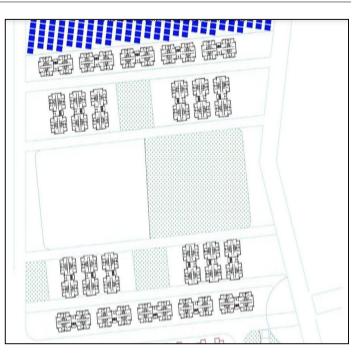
LAYOUT PLAN FOR FLAT (LIG)
